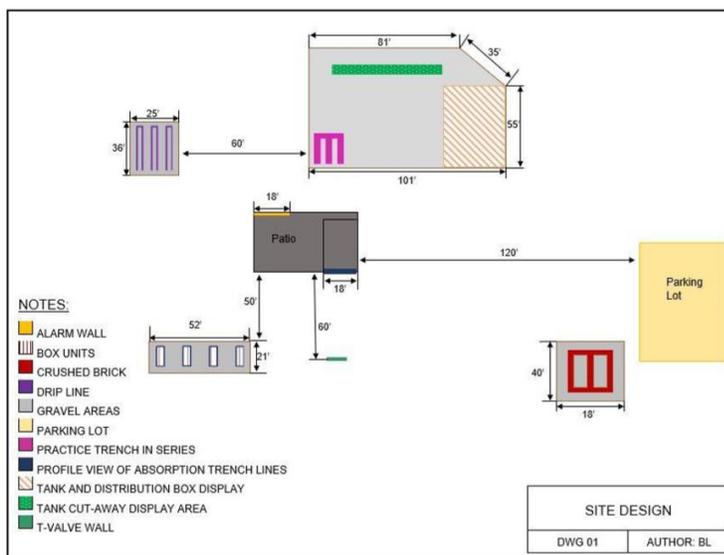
Layout of UGA-Griffin On-site Water Treatment training facility. (Image drawn by Lunsford, 2019)
